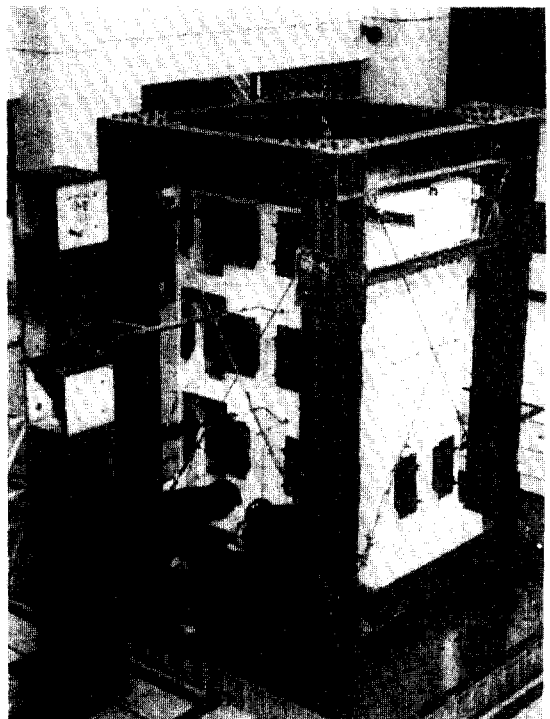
1/3-scale 3-story wet-jointed precast concrete box model on the shaking table
